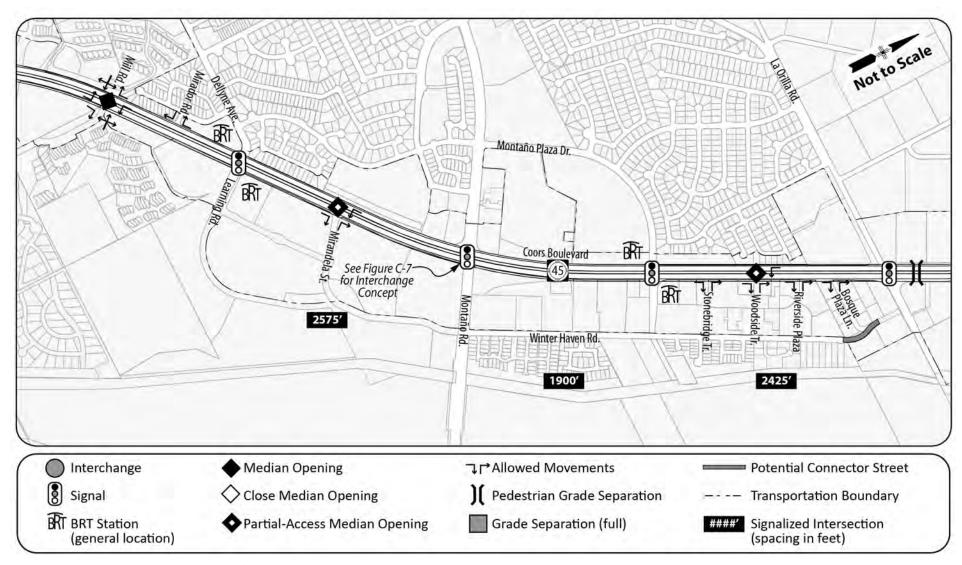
Dellyne Avenue / Learning Road to La Orilla Road
